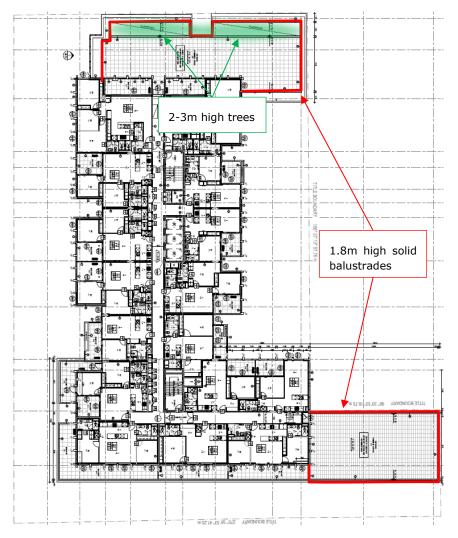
Recommended wind control measures overlaid on the Level 6 floor plan.
